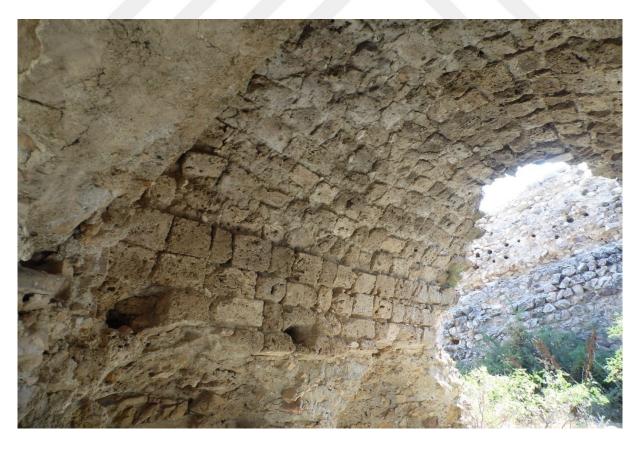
Tower South Wall (Section 5-5) and Stone Vault
